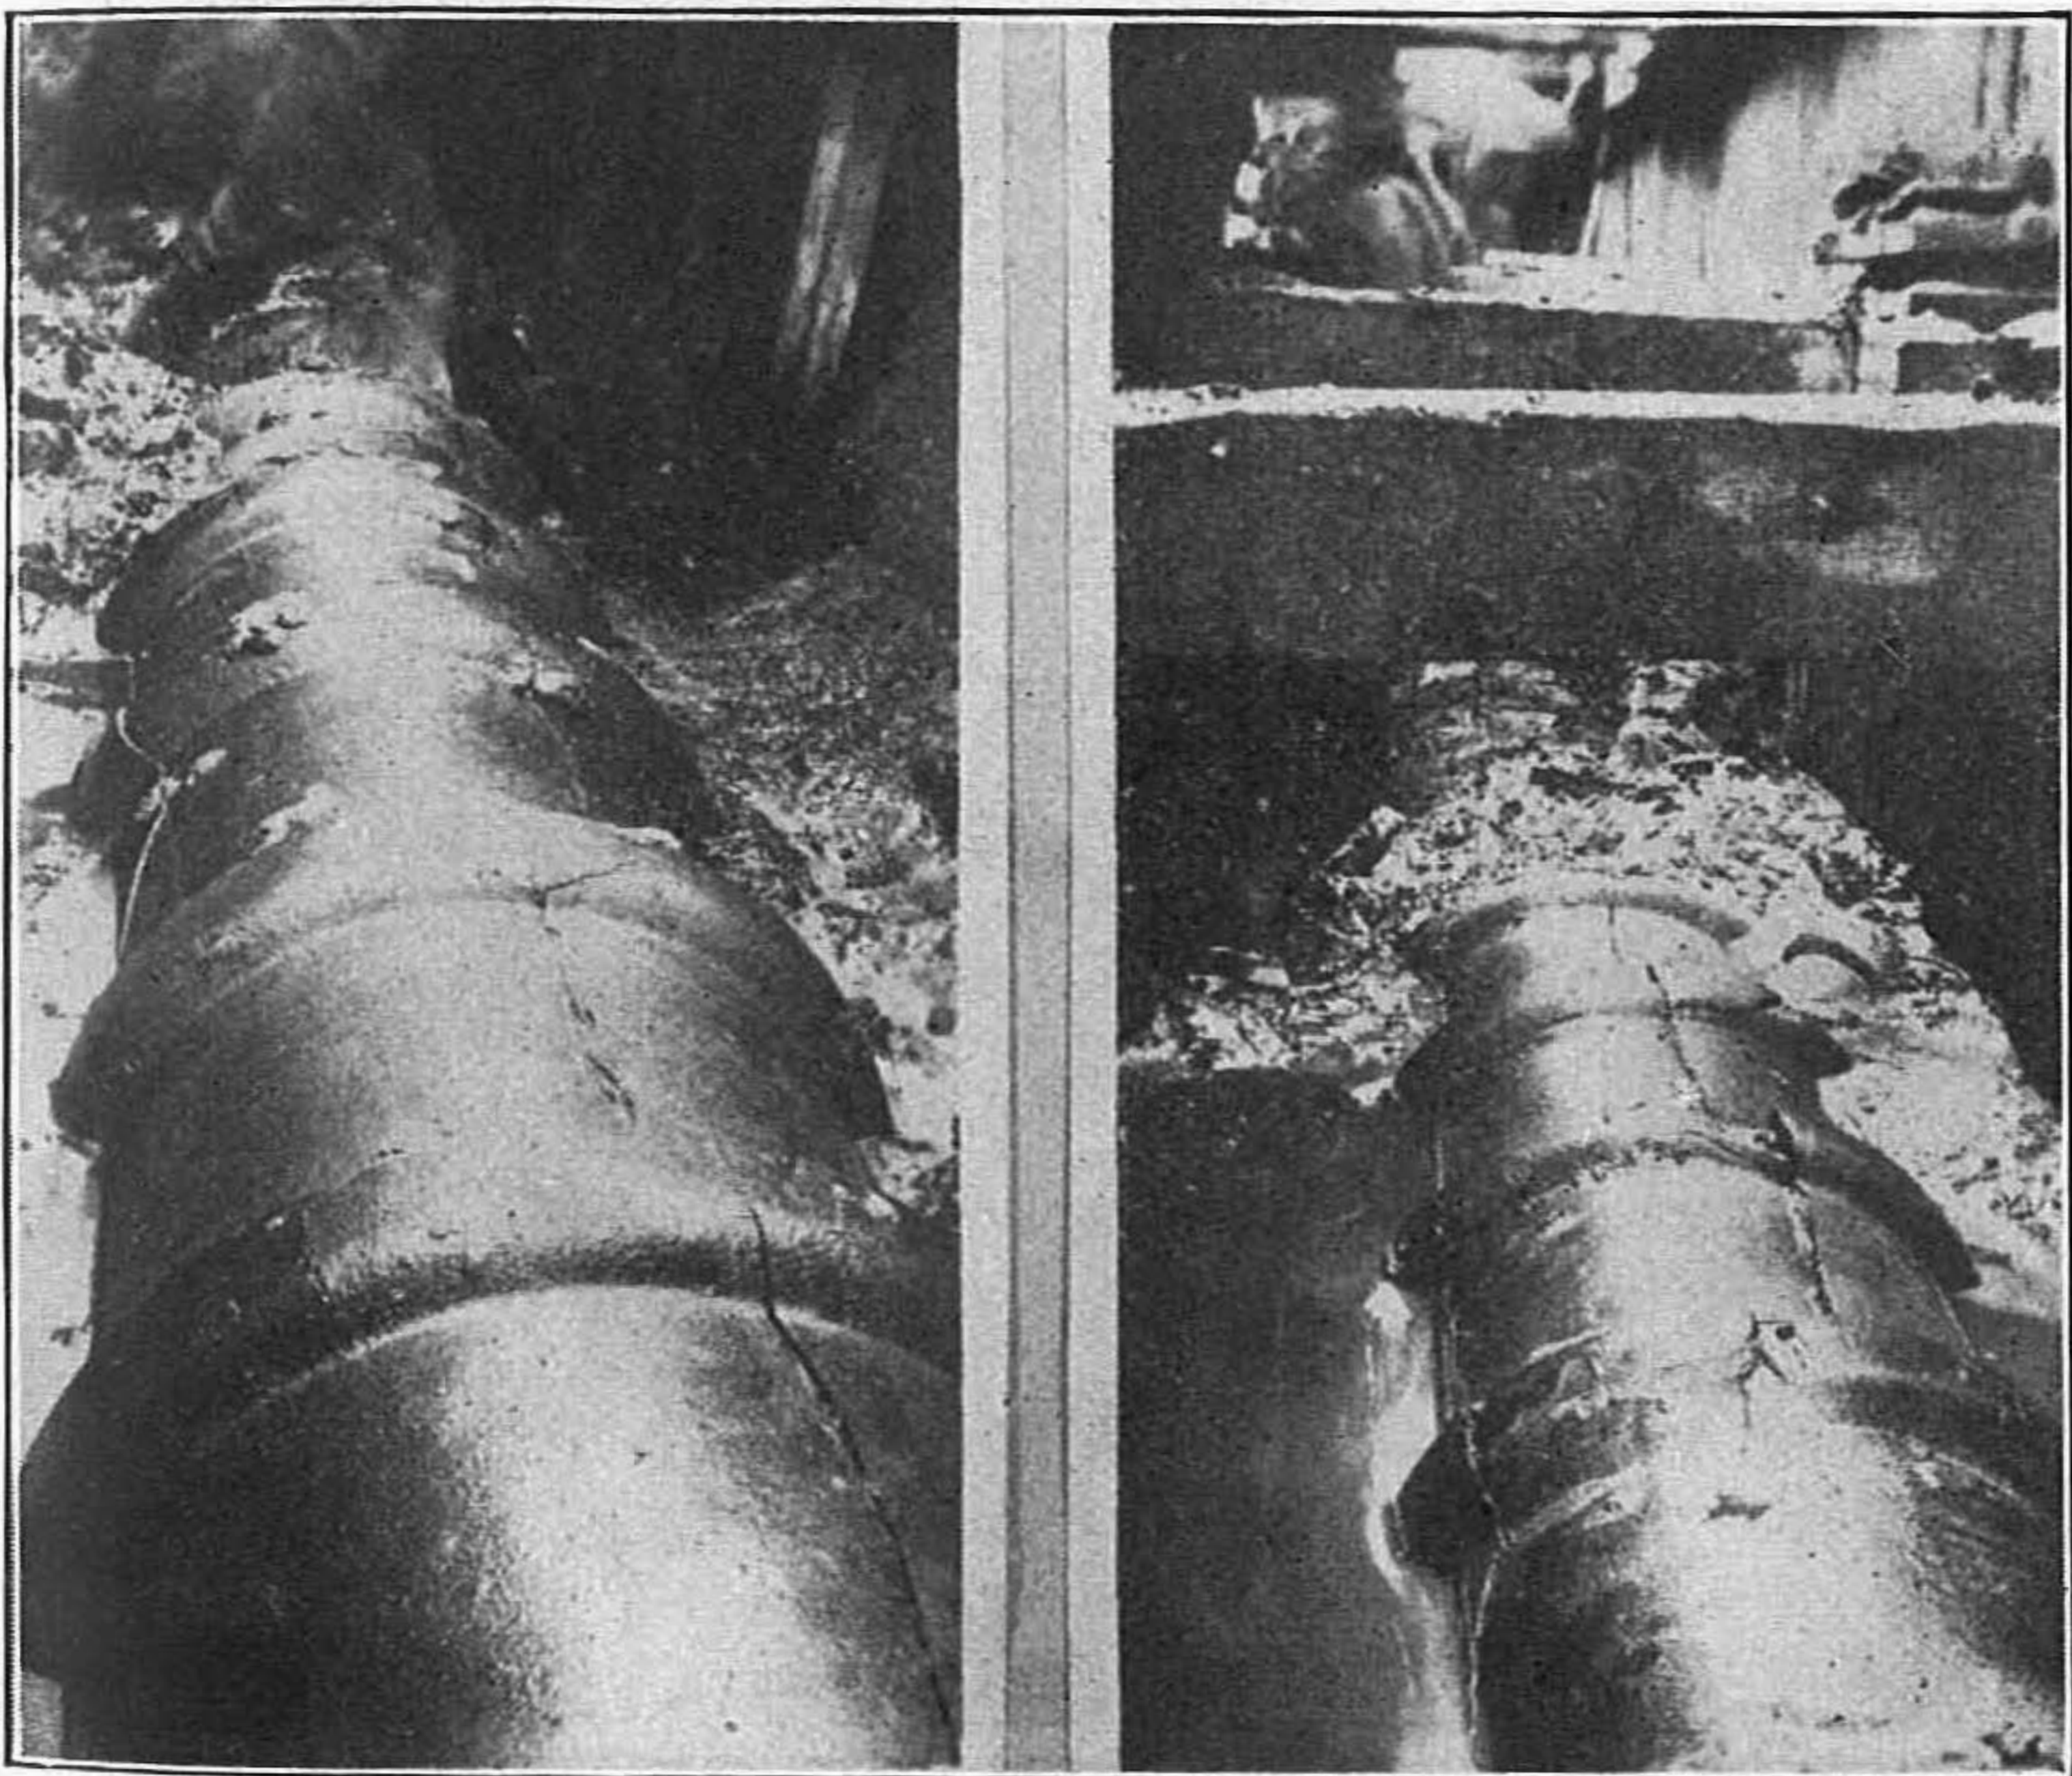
Two Views of Cracked 20 Inch Vitrified Sewer Pipe in Alley 8, Gary, Ind., 1908.
